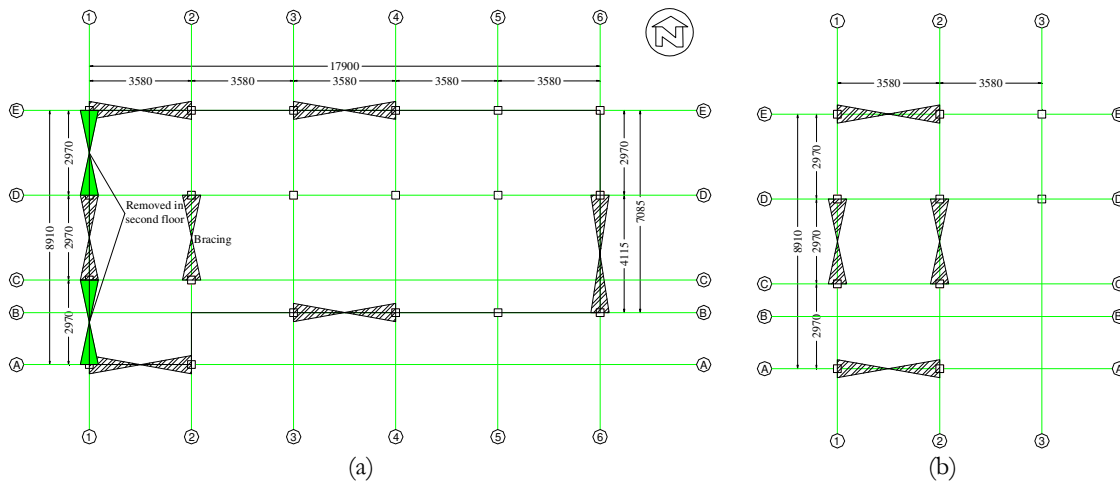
Bracing layout in the MRT2 building; (a) Plan for the basement, ground, first and second floors, (b) Top floor plan (all dimensions are in mm)
